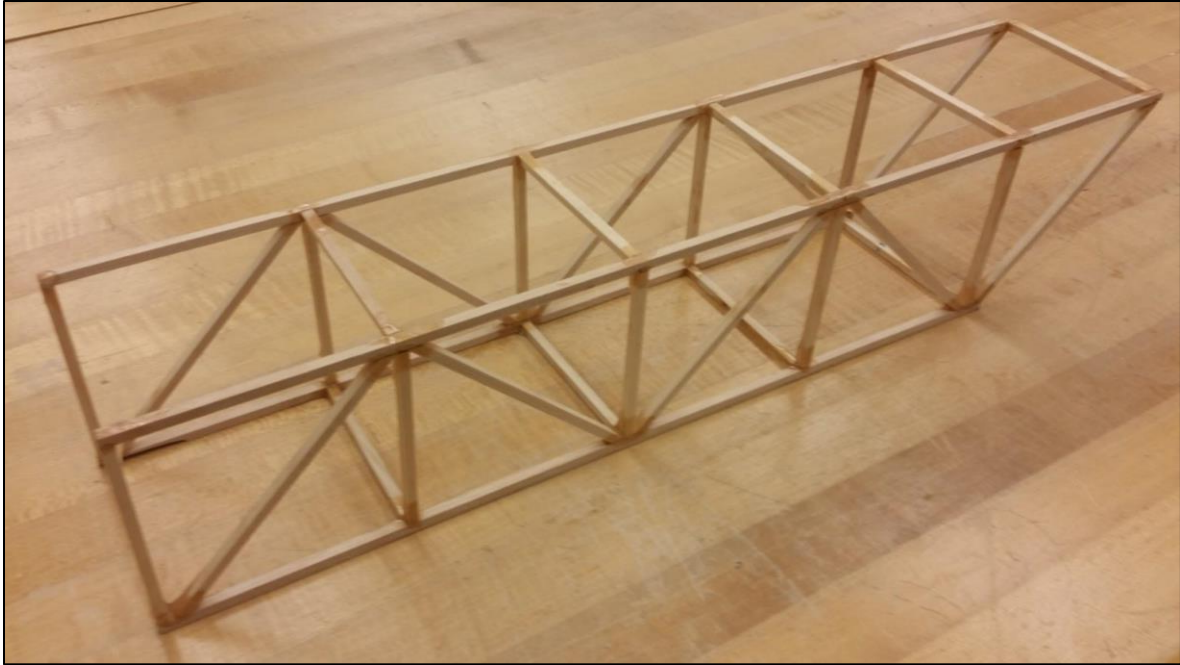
Isometric picture of a completed truss assembly as built by Part 147 students.
